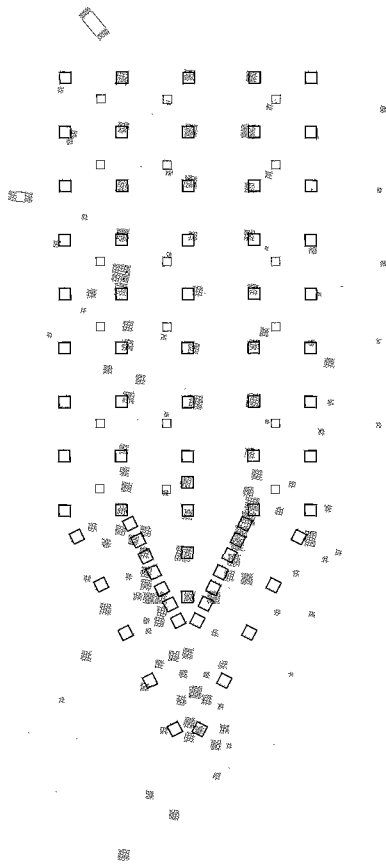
Plan of pile group 2000 with projection of pile-driving plan (see fig. 44)
